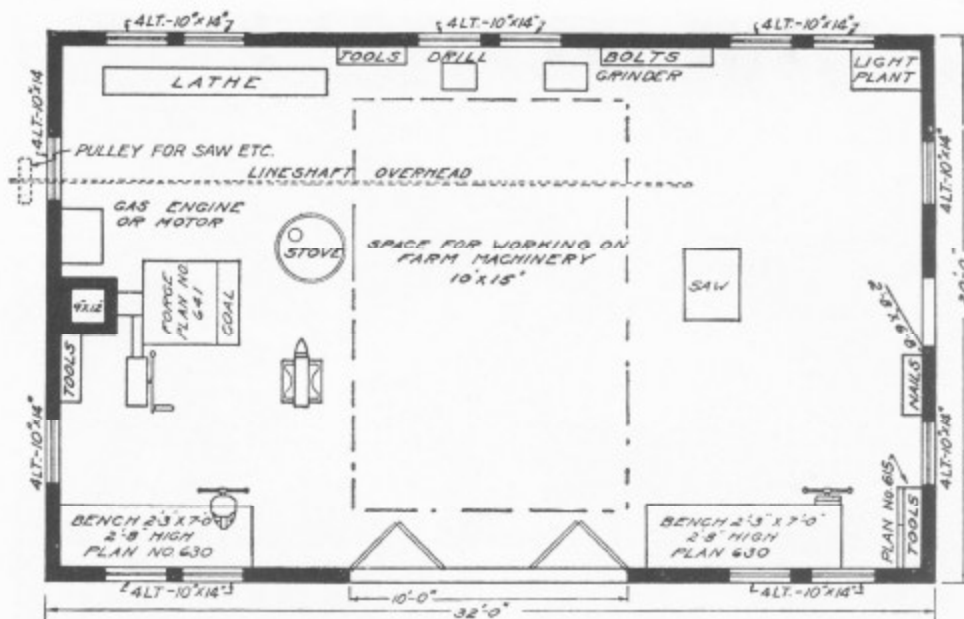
Floor Plan of Farm Mechanics Shop Building.
